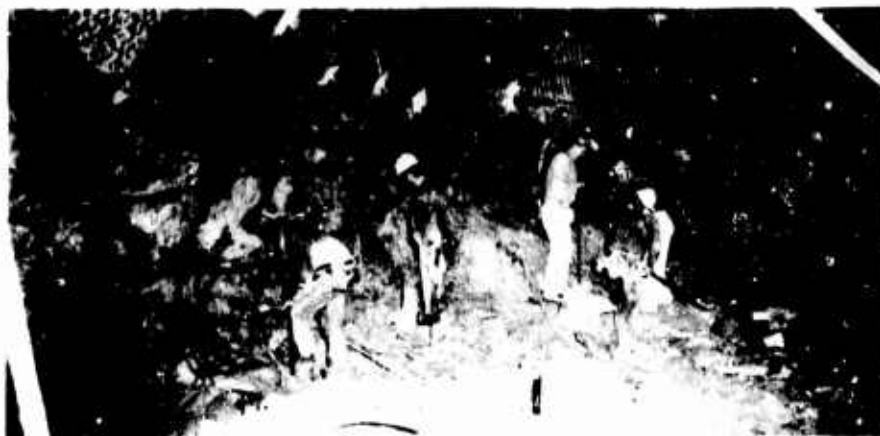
Blasting in dome of Cavity 1. Bolts 3 ft above floor have been tensioned. Miners are loading charges prior to blasting approximately 4 ft into the wall
